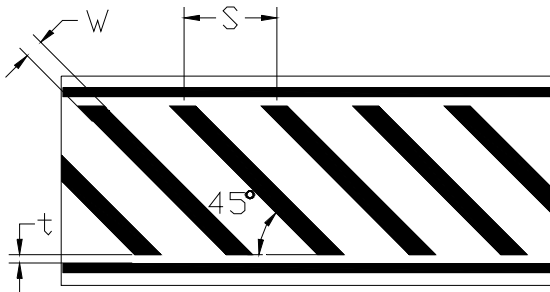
,٥,٣f Dimensions of Diagonal Hatch Marking
